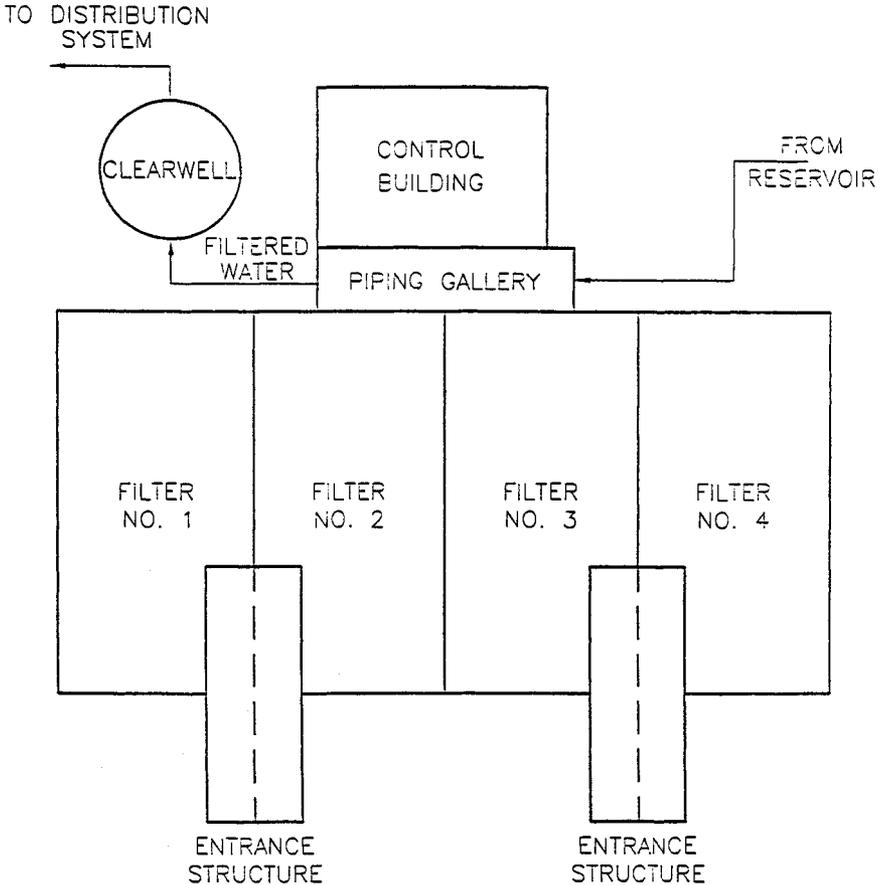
Typical slow sand plant layout with exterior entrance structures.
